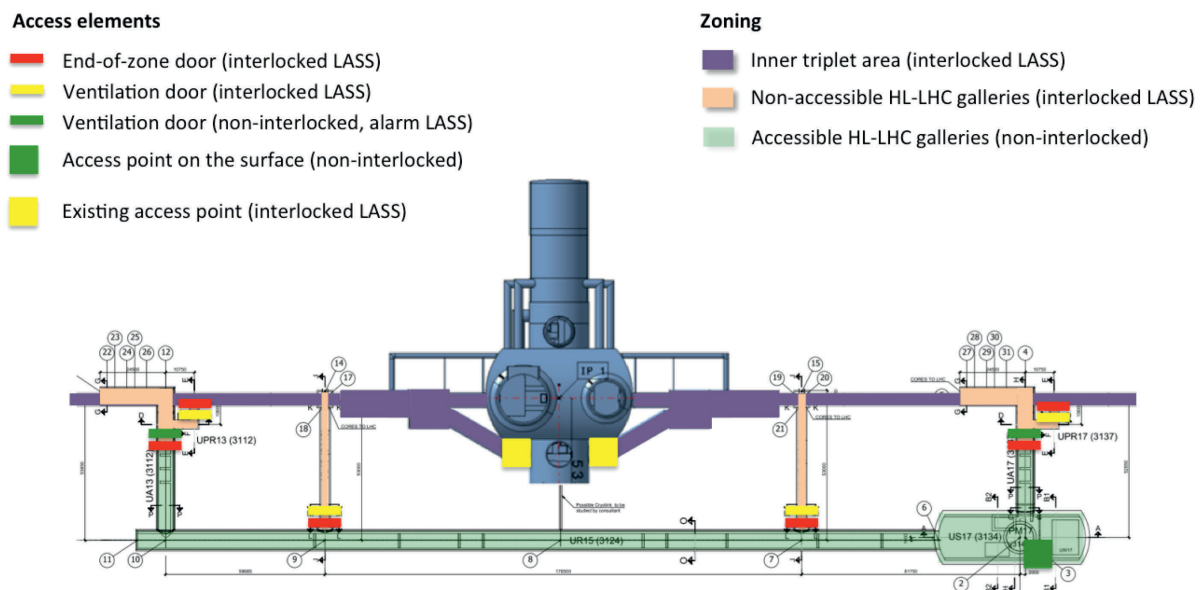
Preliminary underground access zoning and access elements of site 1. Zoning of site 5 will be similar as applicable with the exception of existing access point and service tunnel locations.
